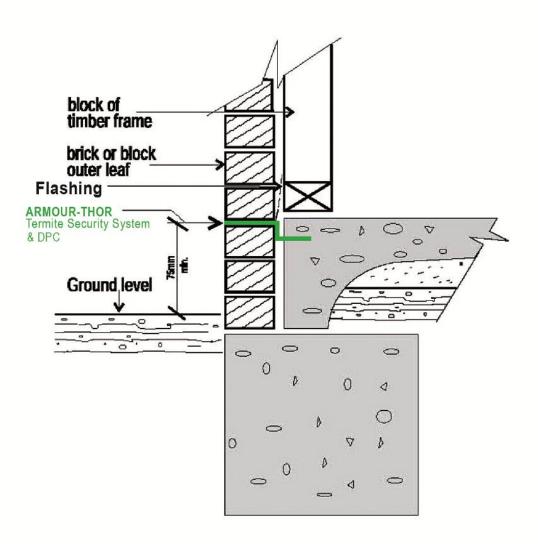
Outer brickwork is used as formwork, ARMOUR-THOR is folded over brickwork. Concrete slab is poured inside brickwork and ARMOUR-THOR is cast into concrete slab.
